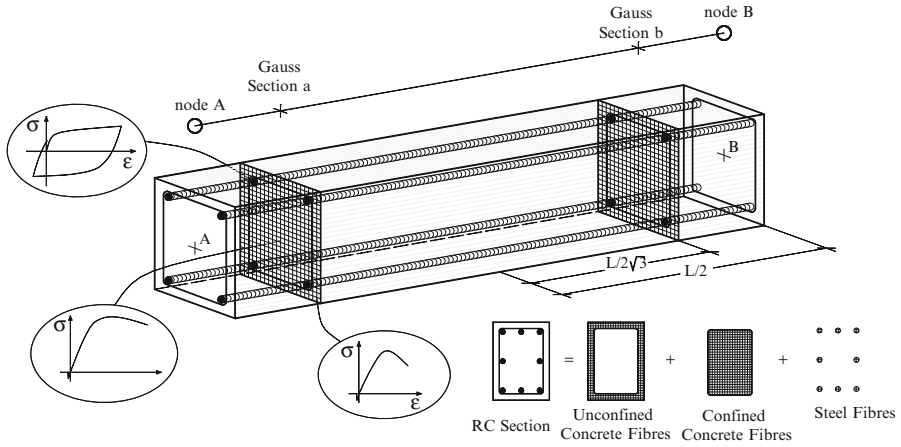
Discretization of a typical reinforced concrete cross-section
